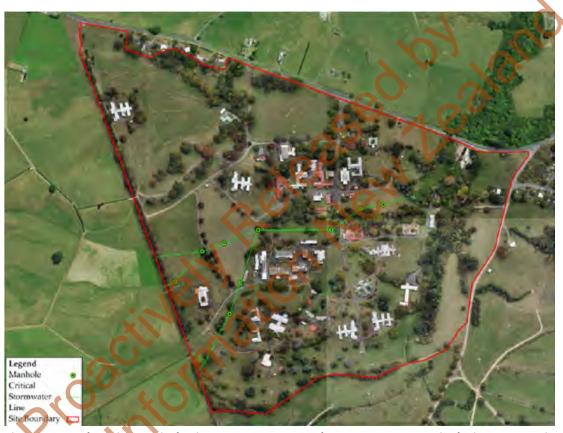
Tokanui Hospital Site – Current Trunk Stormwater Reticulation conveying upgradient runoff through Site
